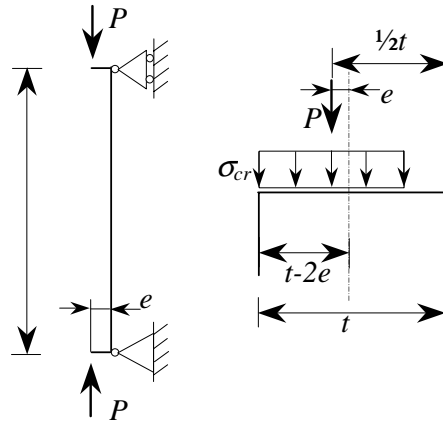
Eccentrically loaded column, Danish code of practice (DS414)
